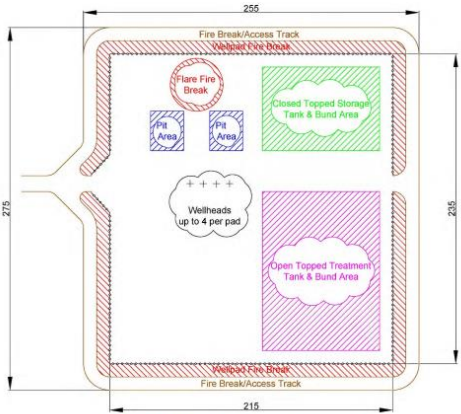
EP187 Indicative Wellpad footprint with tank layouts
